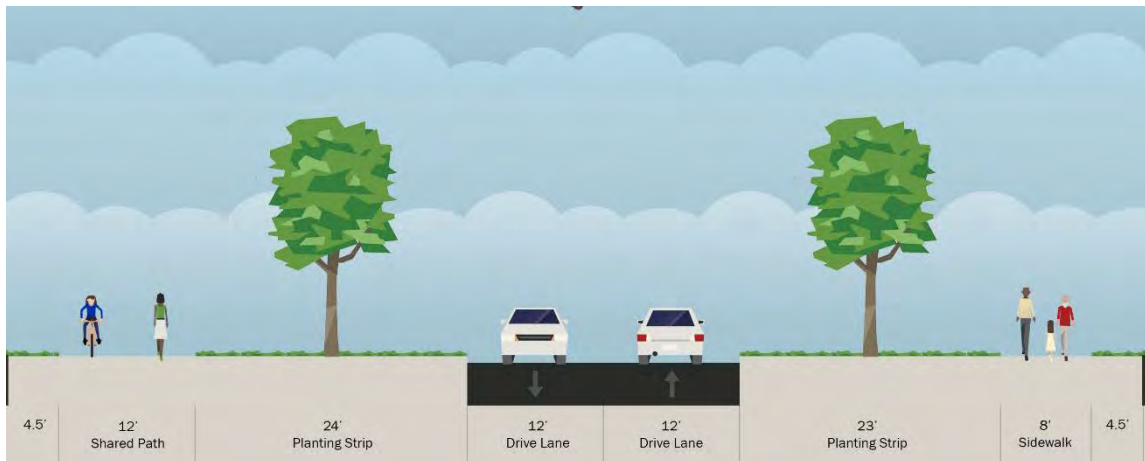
Hoffner Avenue (eastern section looking west) Cross-Section
